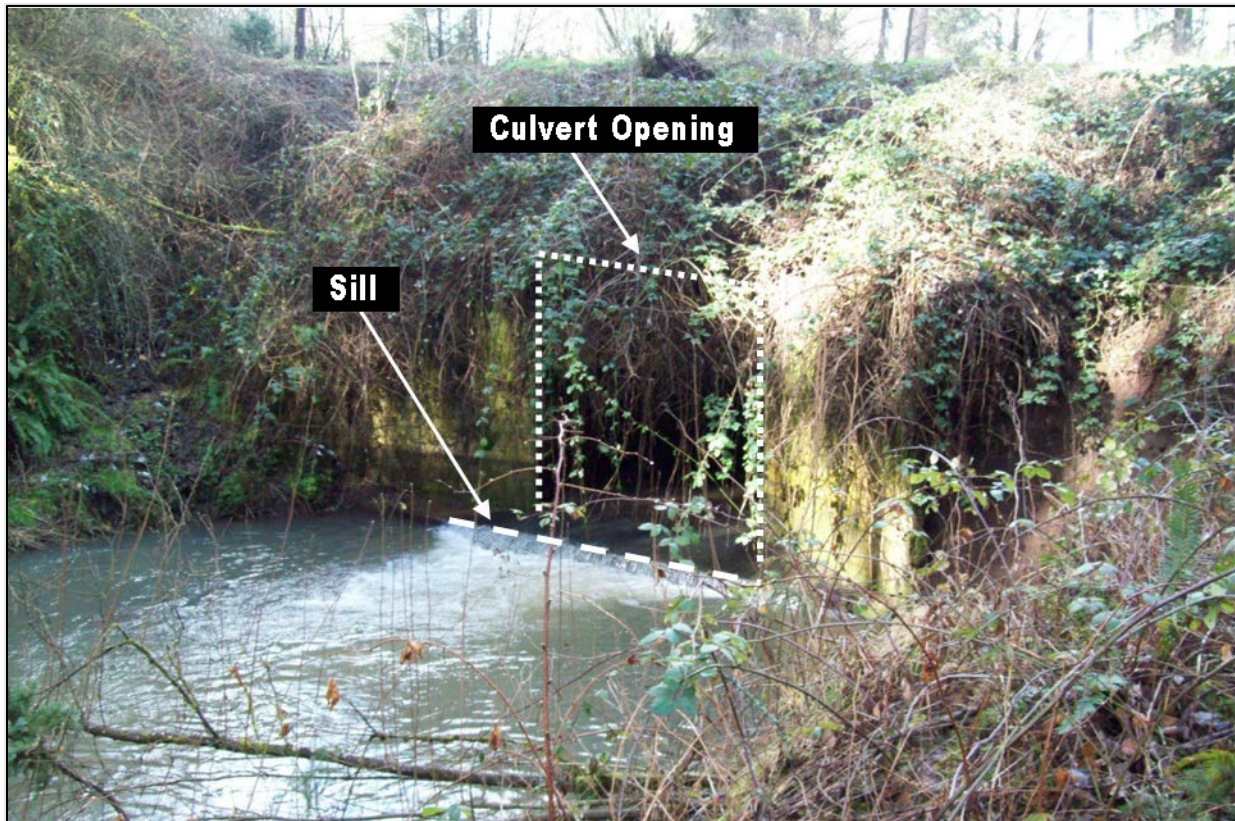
Looking upstream at the outlet of a culvert carrying Newland Creek (Oregon). Image used by permission of WEST Consultants, Inc.
